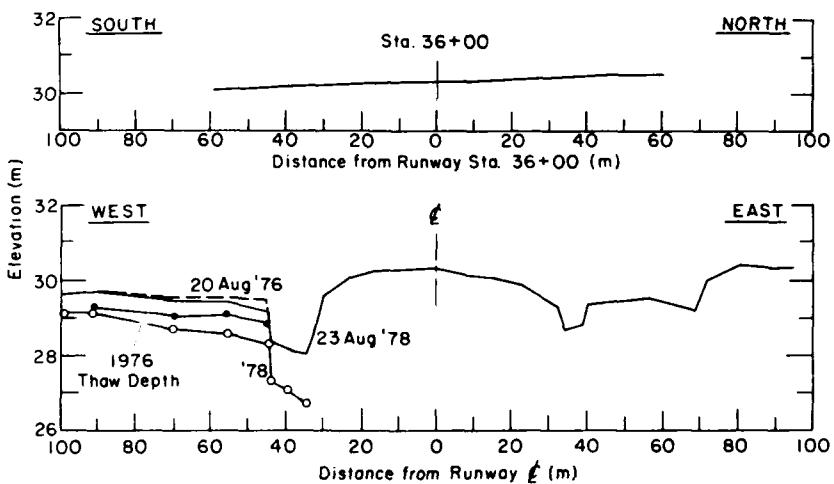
Surface elevations, north site, Prospect Airfield. The upper graph shows the elevations on the centerline profile, 23 August 1978; the lower graph shows the elevations on the cross section, runway station 36+00.
